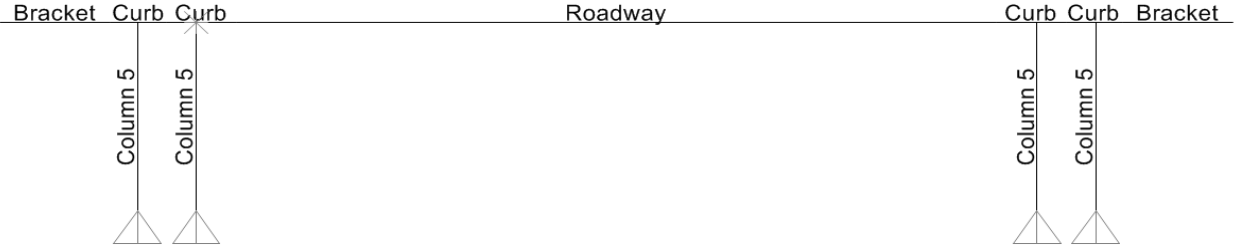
Span VII Beam and Column 5 Model - Case B (SAP 2013)
